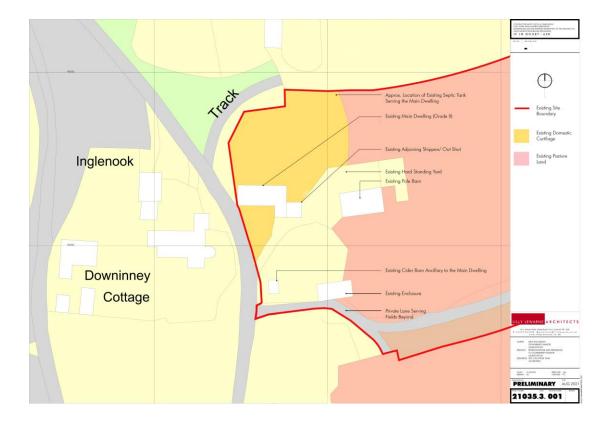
LLA Mapping of existing curtilage arrangement as referred to in section 1.5 of the Design and Access Statement.
